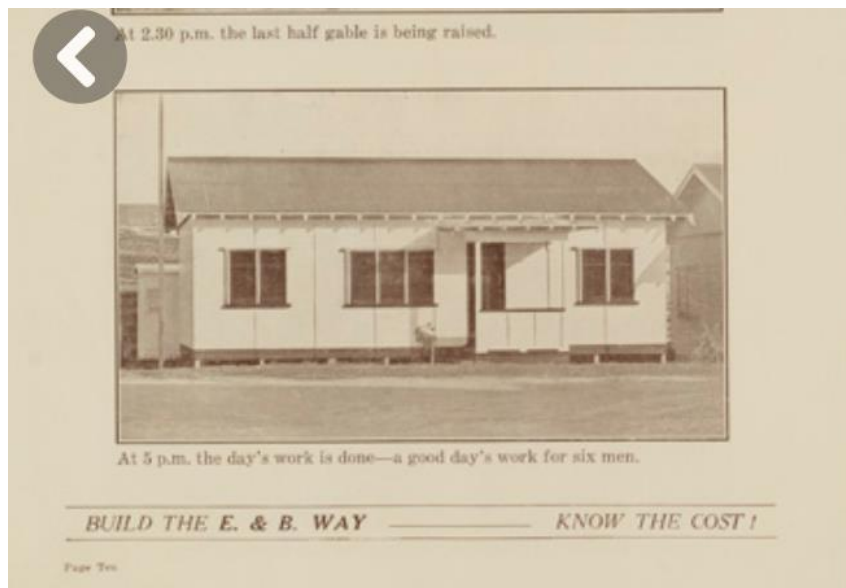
catalogue⁴⁰ of an Ellis & Burnand “ready to erect” (prefabricated) house showing highly visible joints, consisting of vertical battens over joints between the prefabricated panels.
